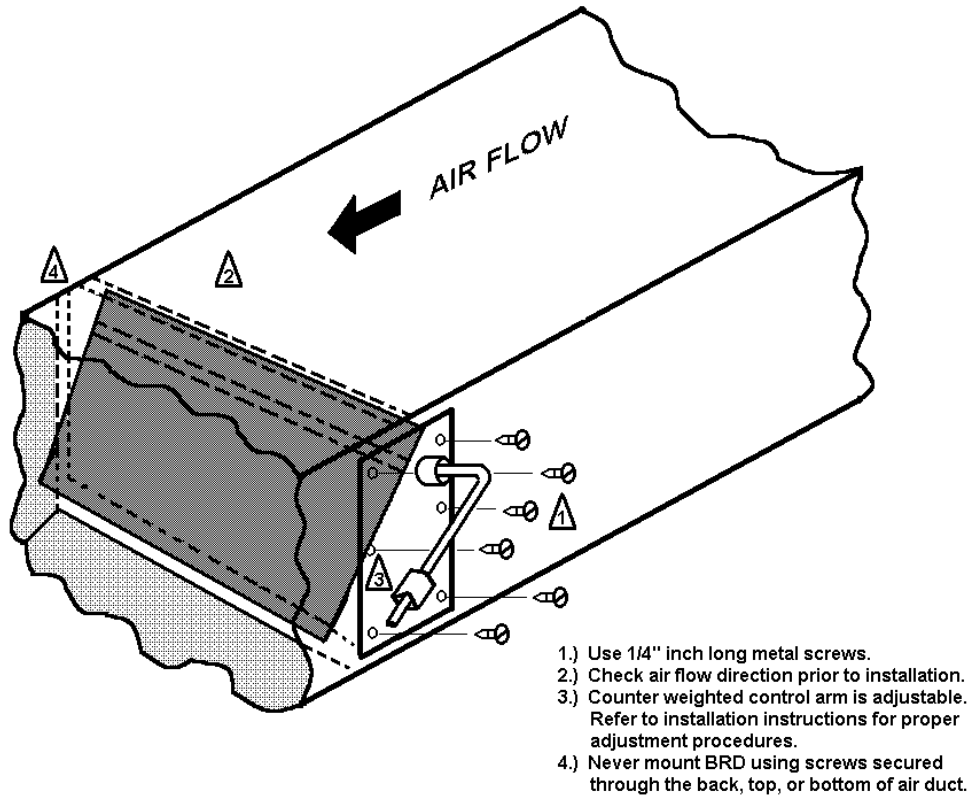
INSTALLING STATIC PRESSURE BAROMETRIC RELIEF DAMPERS
